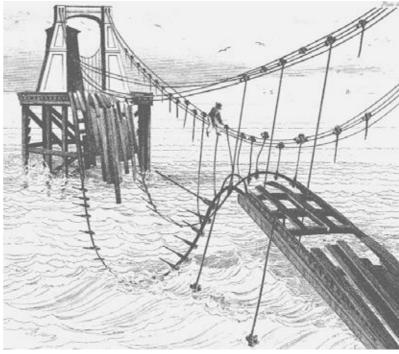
Brighton Chair Pier (1823-96) - damage in October 1833 [Weale's Bridges 1843]
